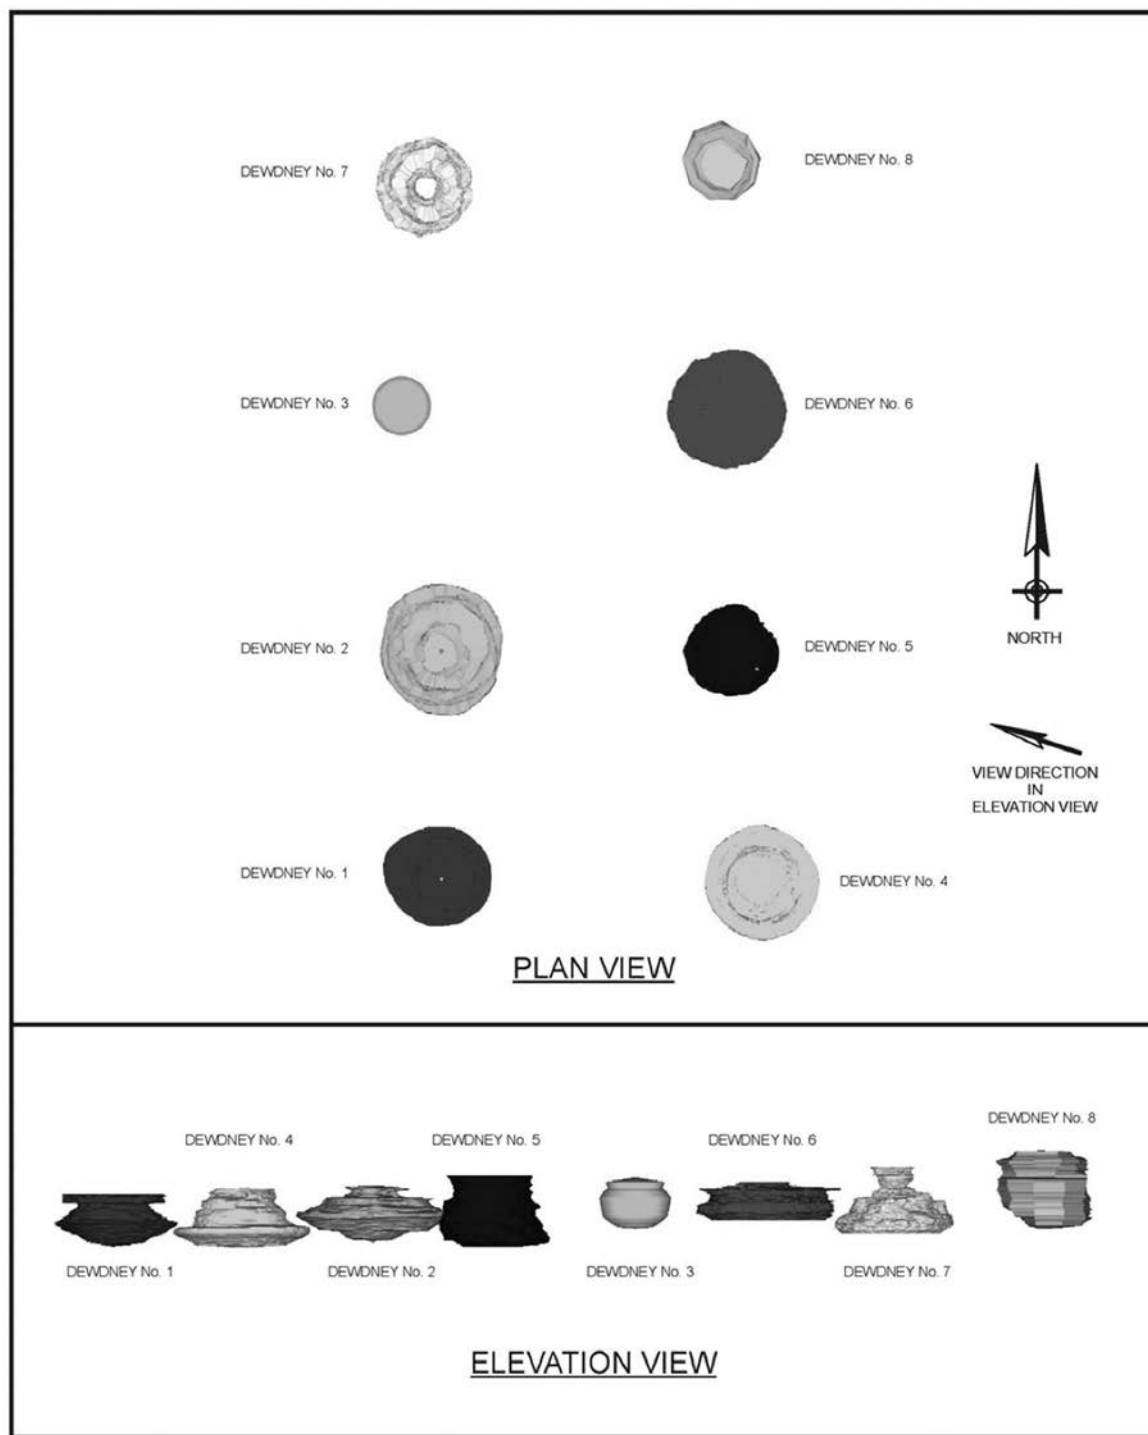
Plan view and elevation view of the Dewdney cavern field (Coleman Hale et al, 2015).
